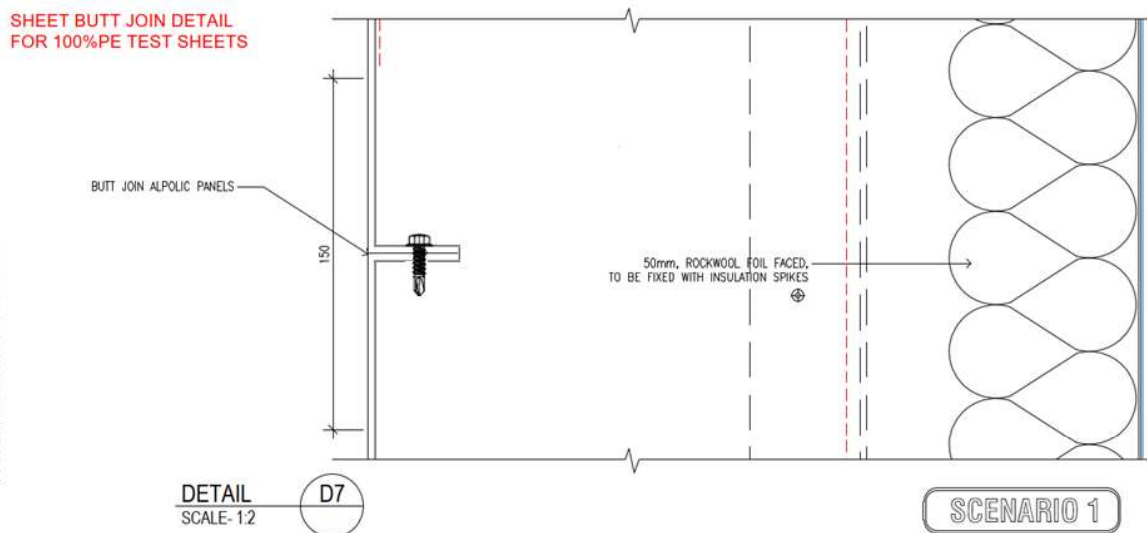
System assembly – panel to panel join vertical cross-sectional view.
